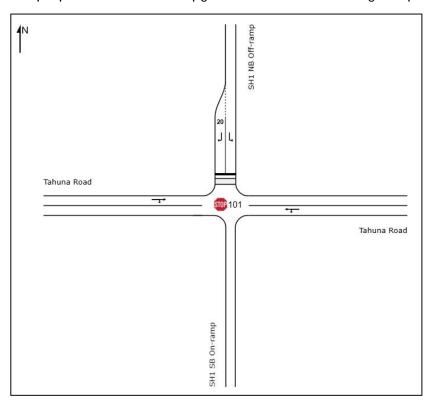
Proposed Intersection Upgrades – SH1 Ohinewai Interchange Eastern Ramp Intersection (for Layout Option 1)
